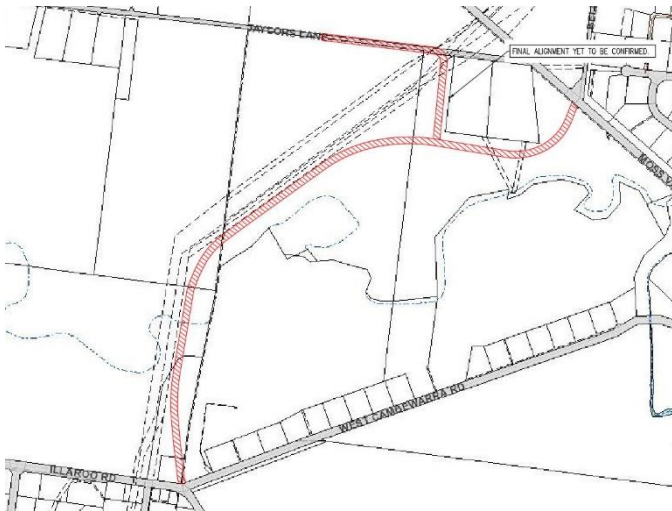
Proposed Alignment of Far North Collector Road (indicative only)
